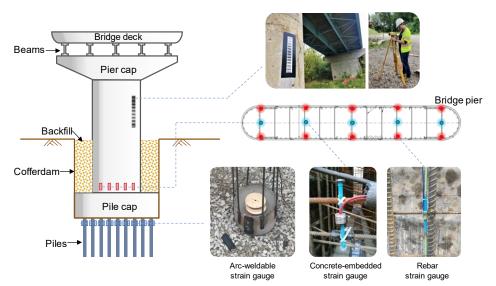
The instrumentation scheme for measurement of bridge pier settlement and load transfer from the superstructure to the foundation elements
